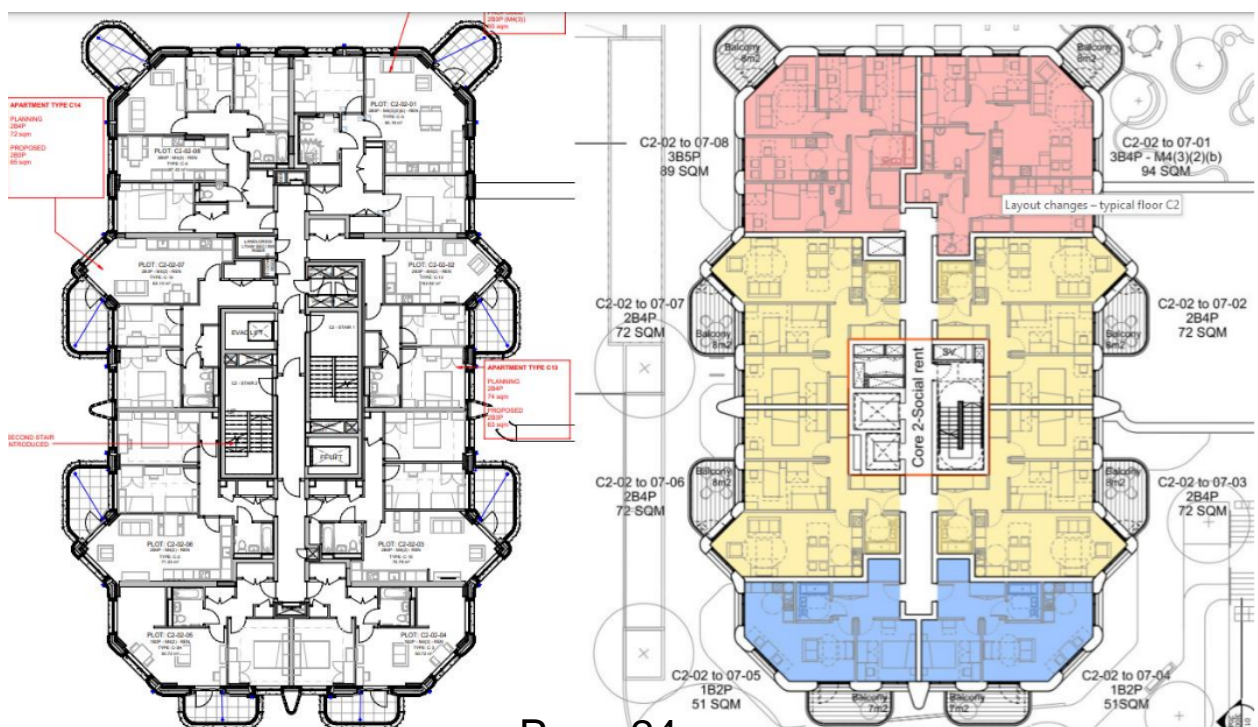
Proposed changes to block C2 (proposed amended on left hand side).
